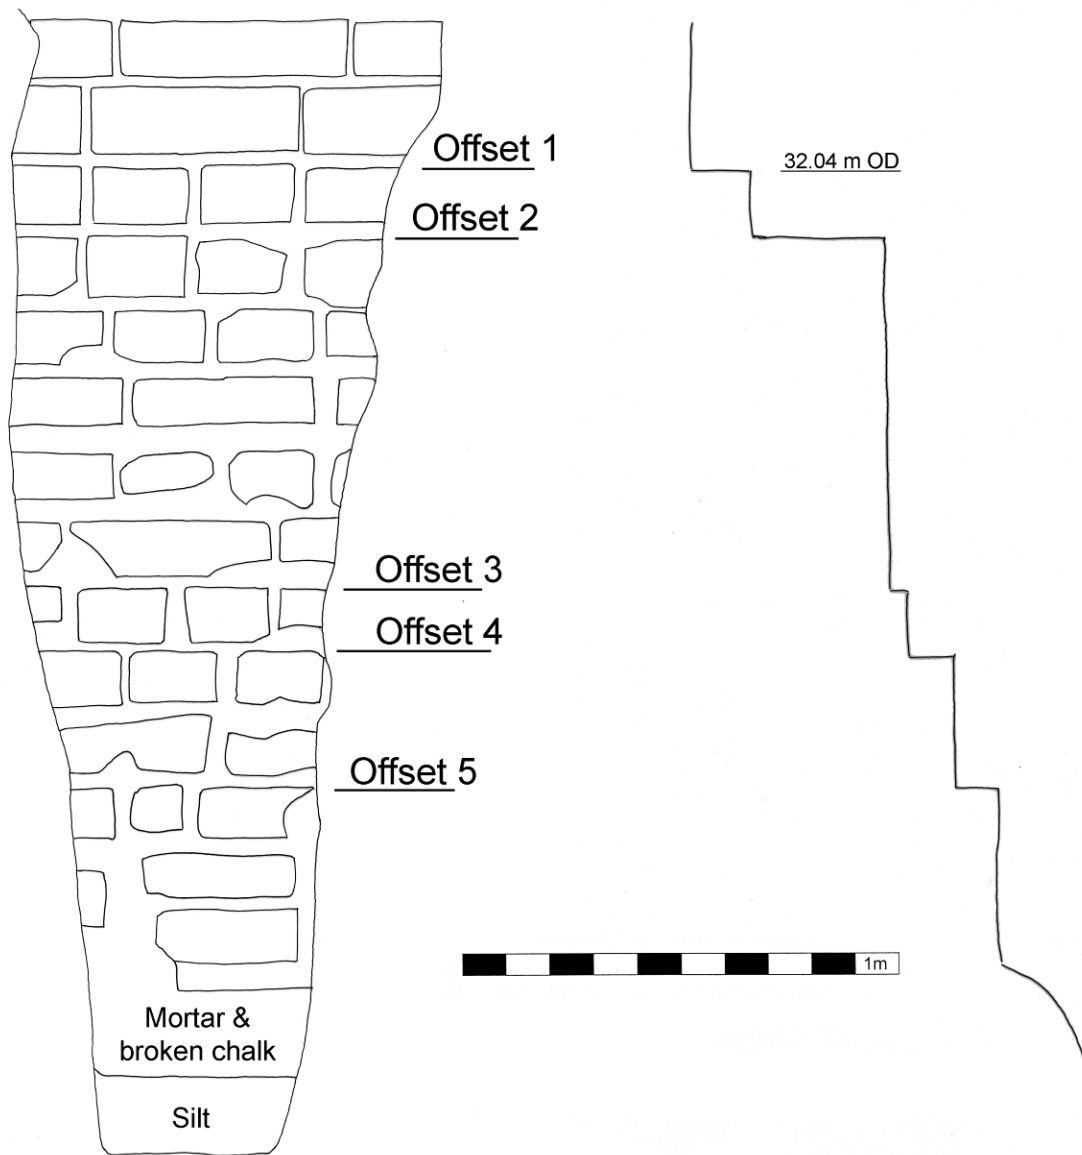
Elevation and profile of the orangery wall foundation in trench CP.
